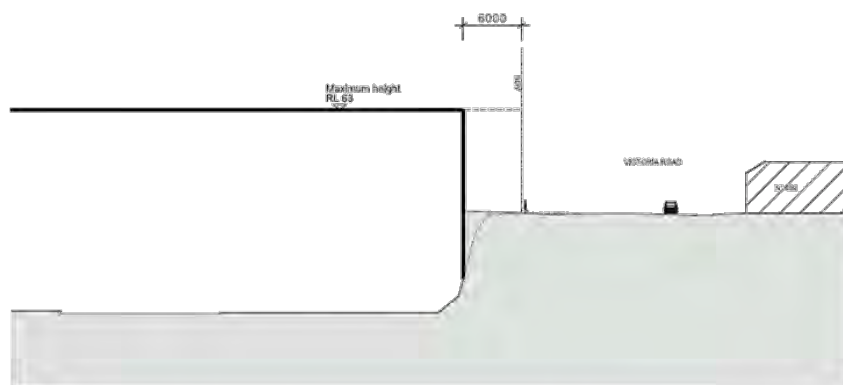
Section E Victoria Road street frontage setbacks.
